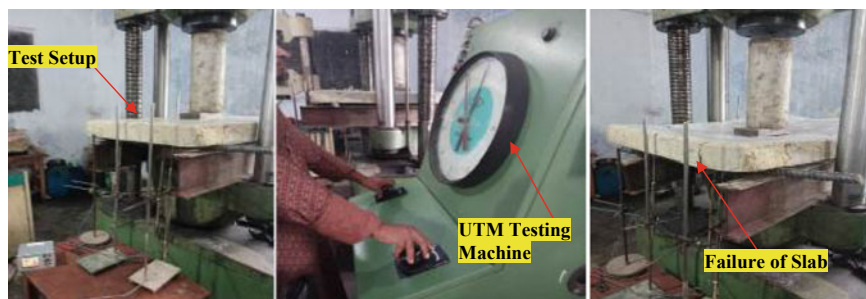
Test setup and testing and failure mode of CFRP strengthen the pre-crack slab
